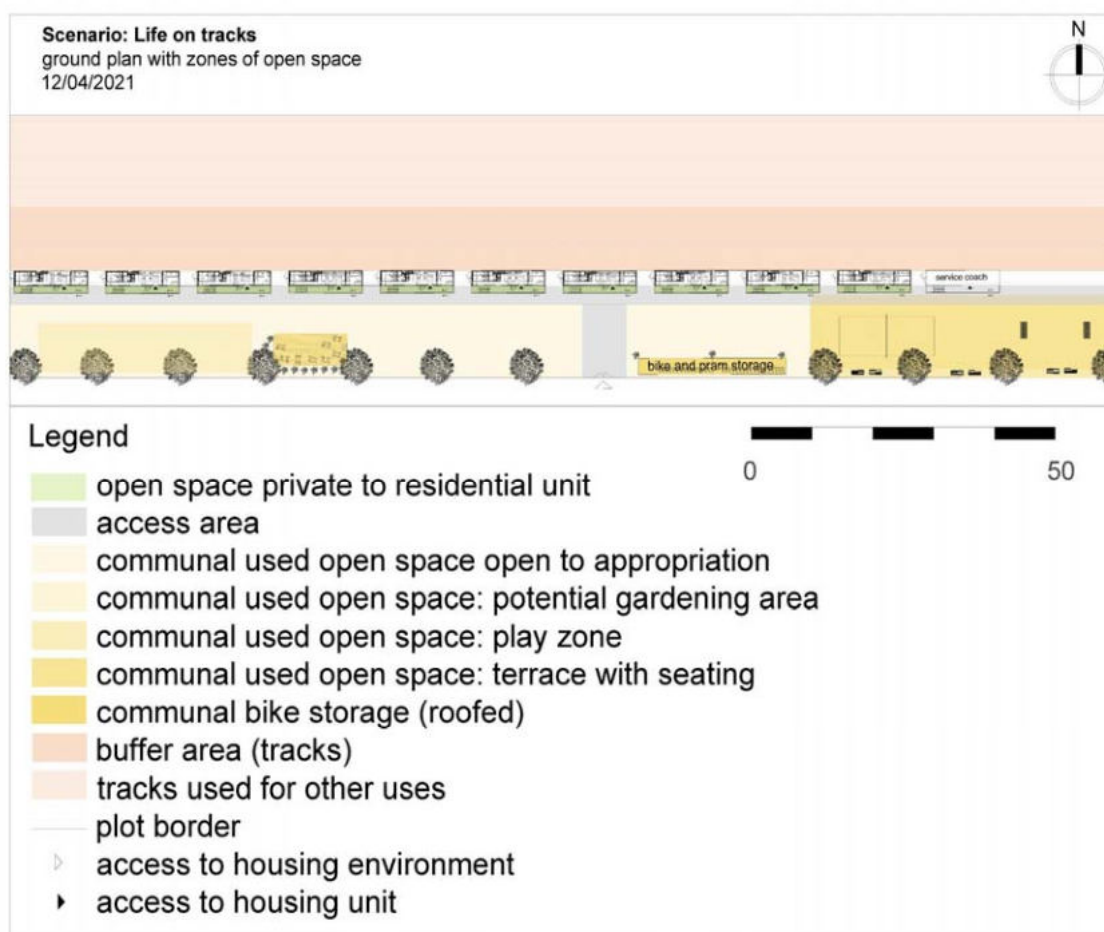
TinyTainer – Site zoning plan<sup>54</sup>
